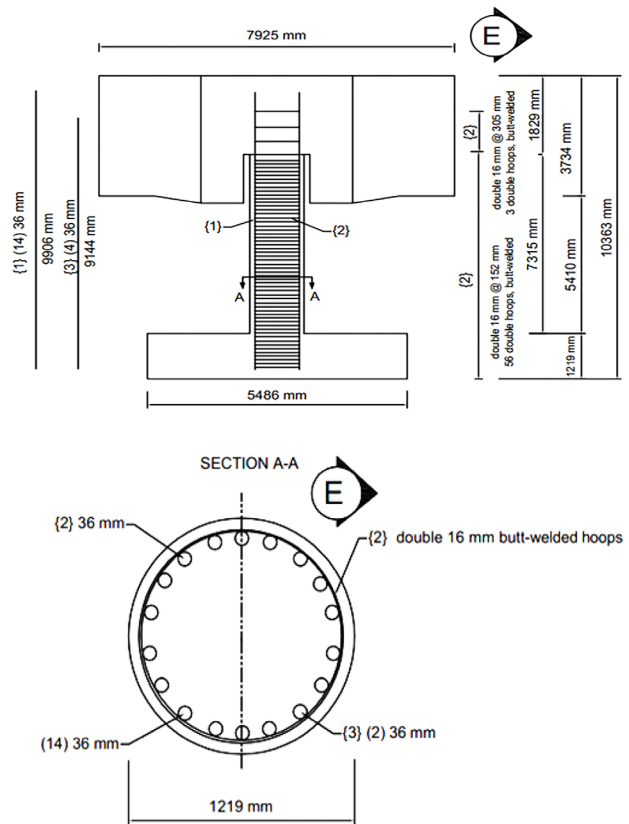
Full-scale RC bridge pier specimen and cross-section [46]
